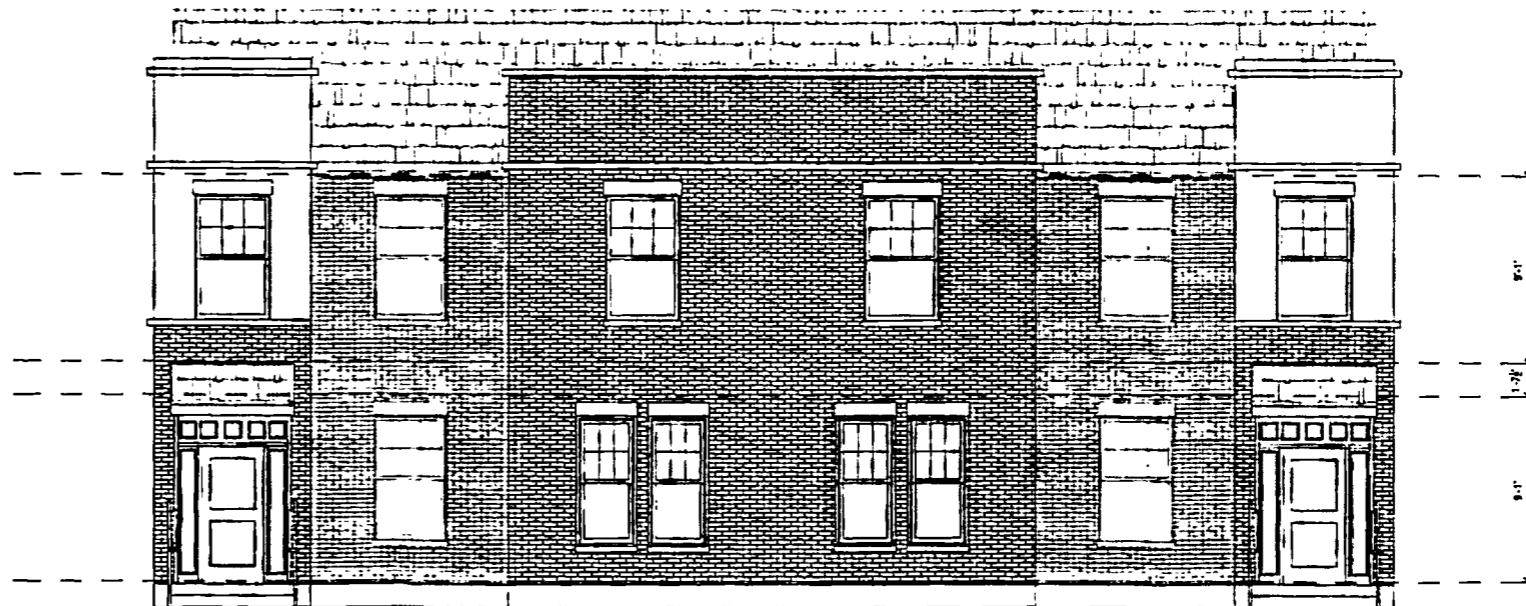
CARRIAGE HOUSE SIDE ELEVATION
